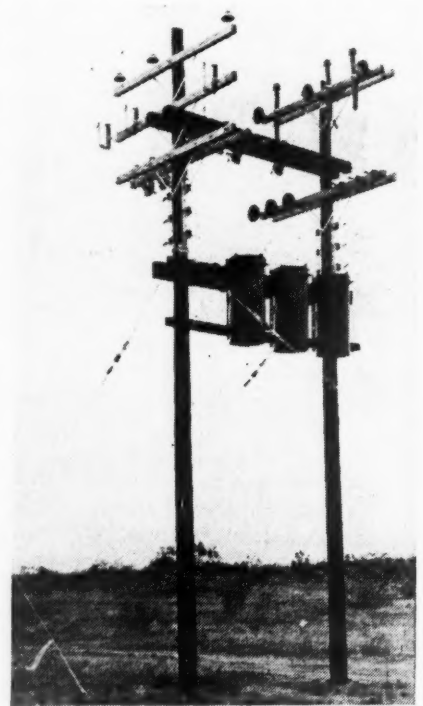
Substation construction showing three 25-kva. single phase transformers with fused cutouts and lightning arresters.
